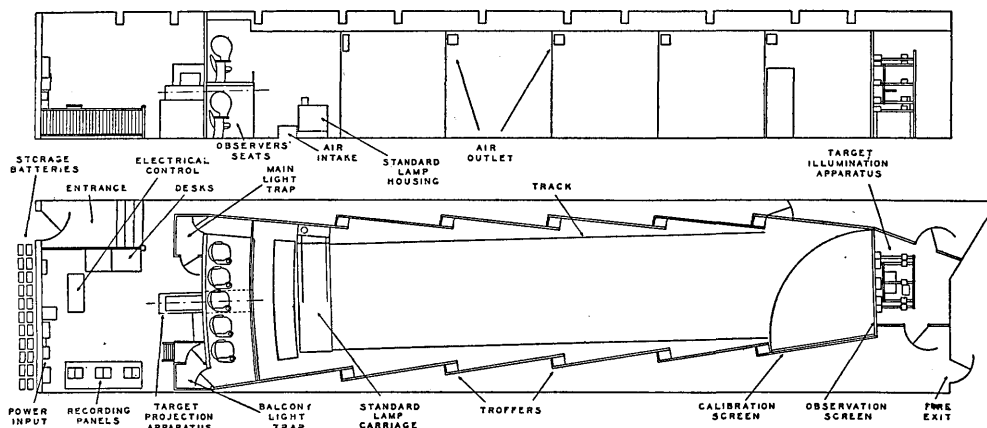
Floor plan of laboratory. Dimensions of the plywood room (observation room) were: length, 63 feet; height, 10 feet, and width at the narrowest points, 10 feet.
